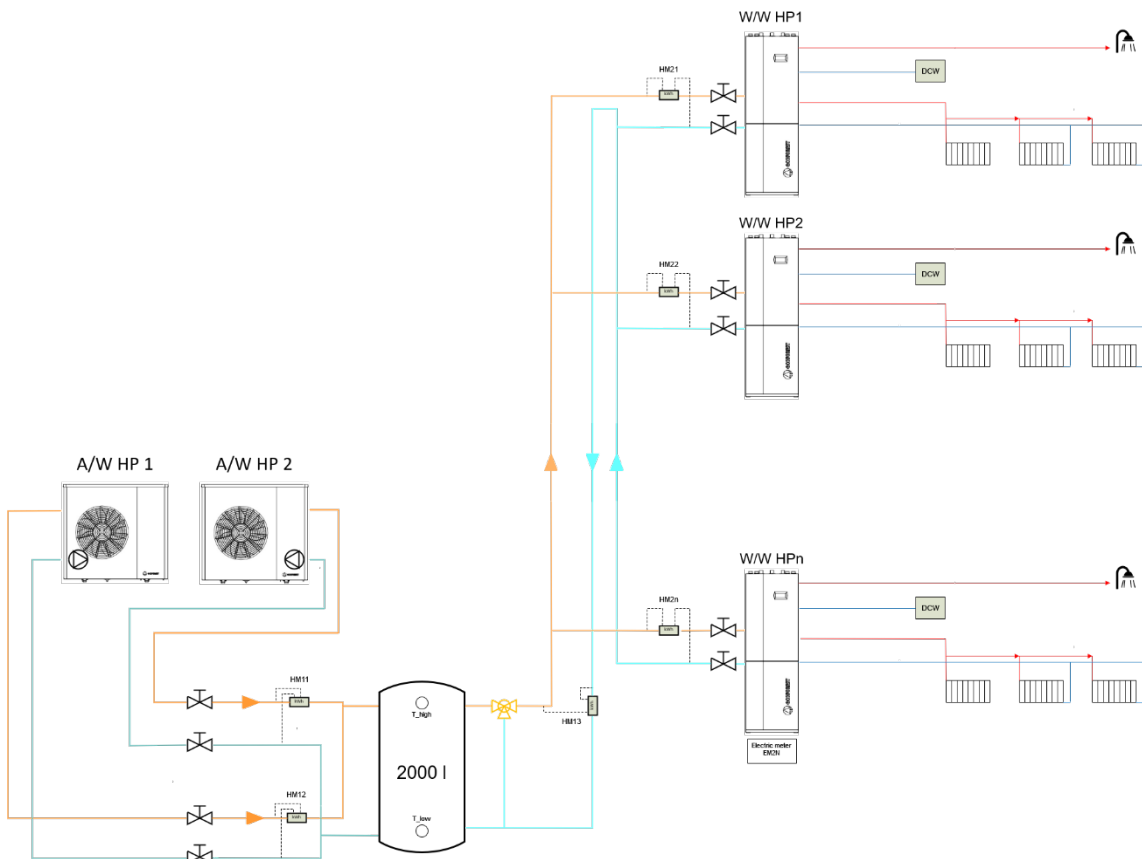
HAPPENING system thermal layout in Pasaia demo site
